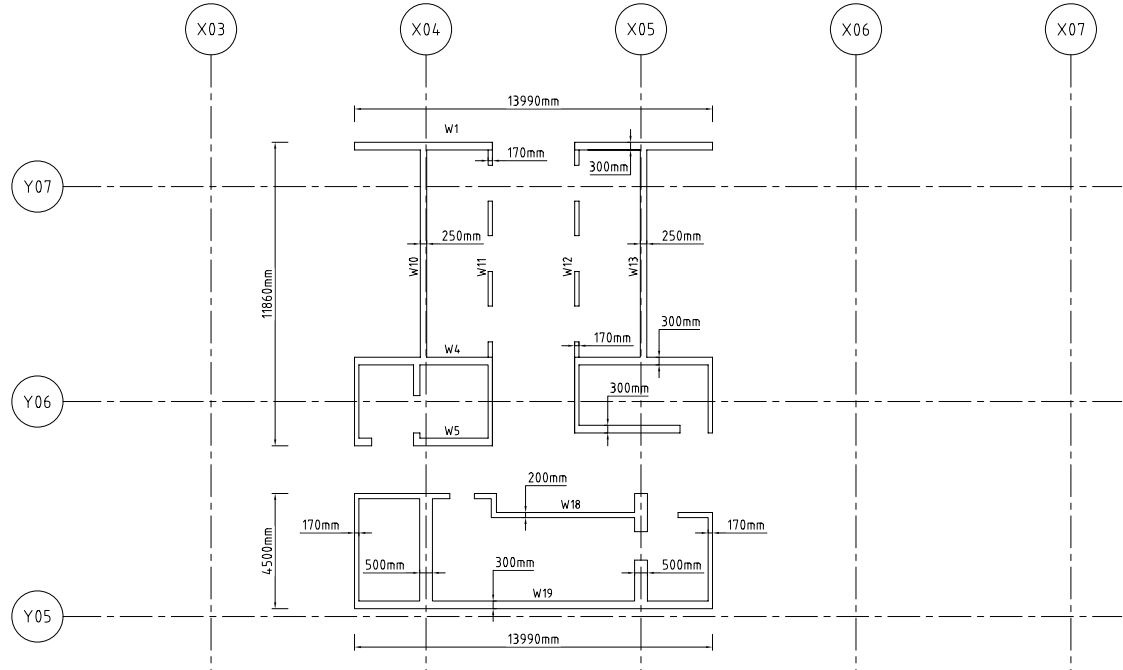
Level 48 Core Plan (Source: Hyder Consulting)
